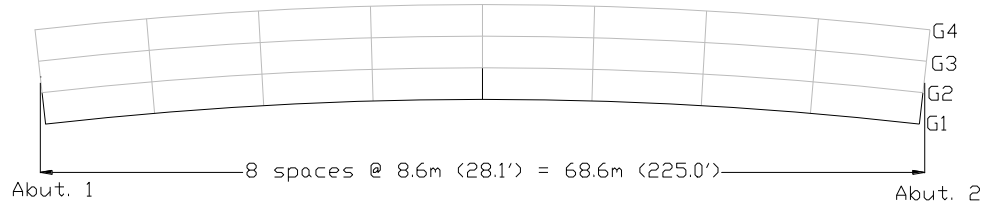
Stage 1 of Construction for Single Girder (Inner Girder Placed First) Erection of Single-Span, 4-Girder, 305-m (1000-ft) Radius Bridge.
